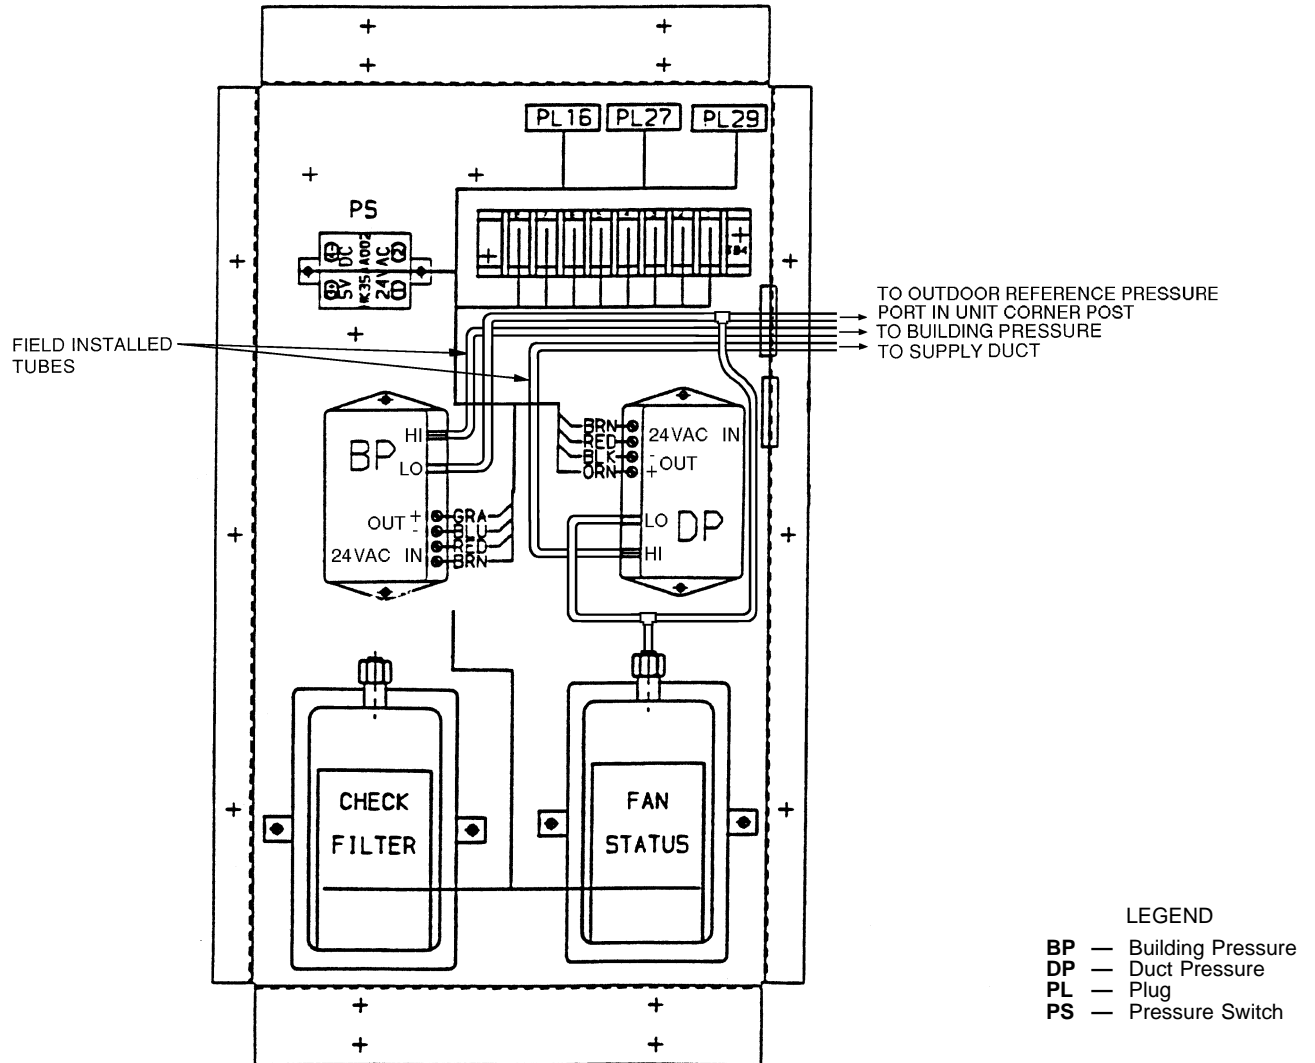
Auxiliary Control Box Details; Size 034-048 Units
